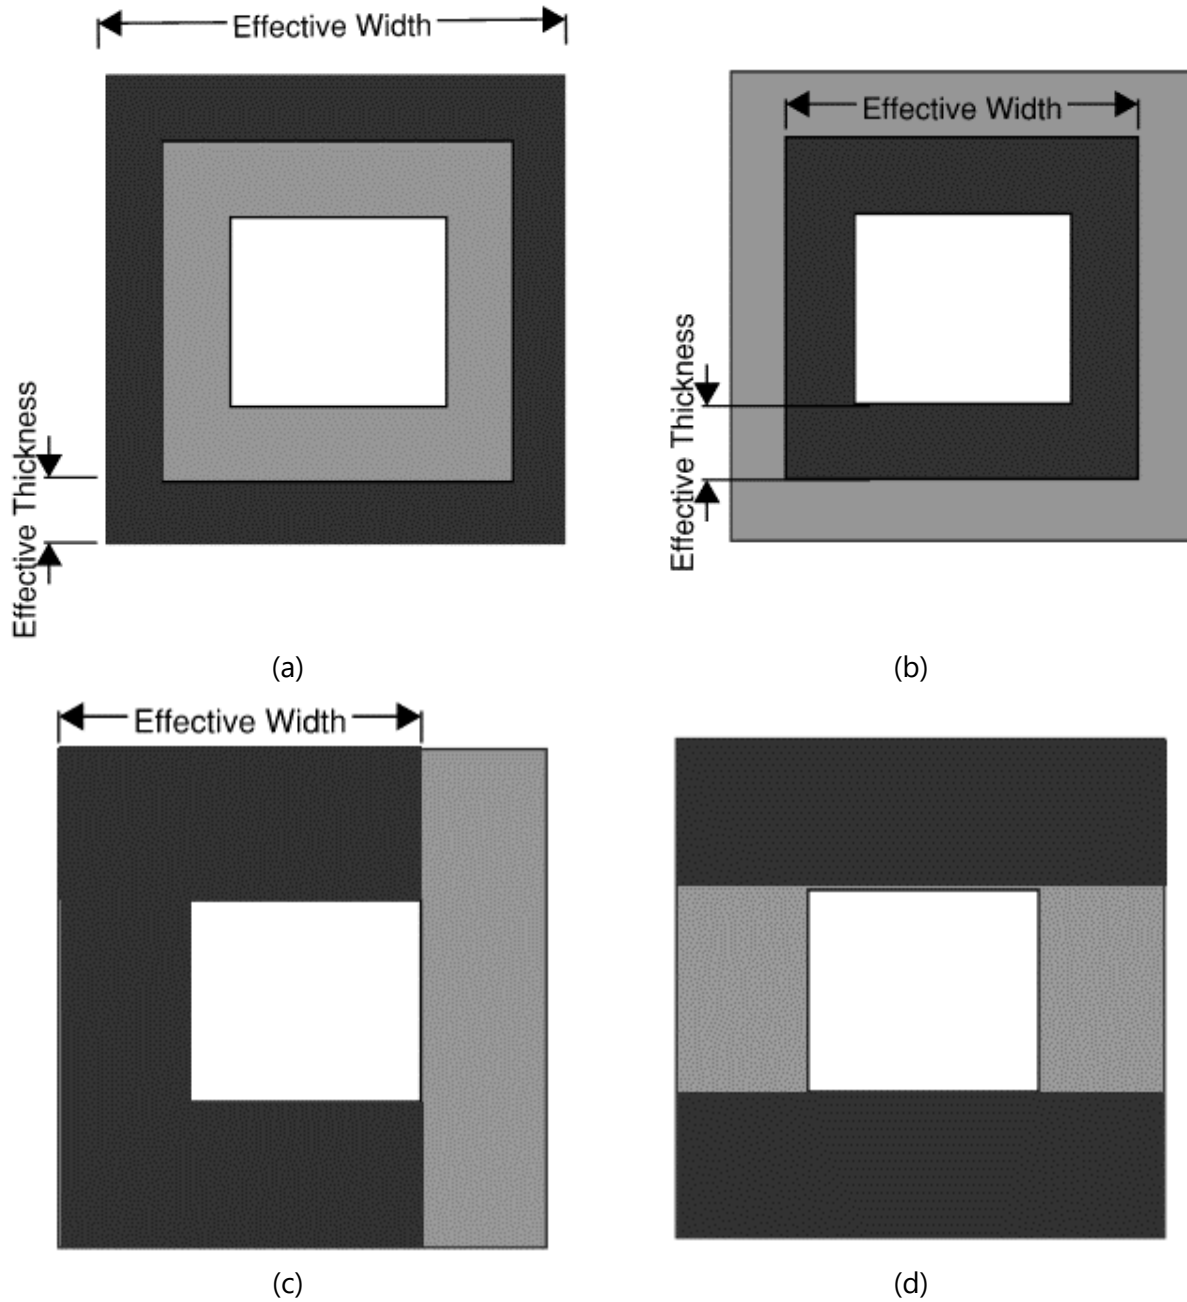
Modified Wall Cross Sections: (a) Outer Wall, (b) Inner Wall, (c) C-Section, (d) Parallel Walls
